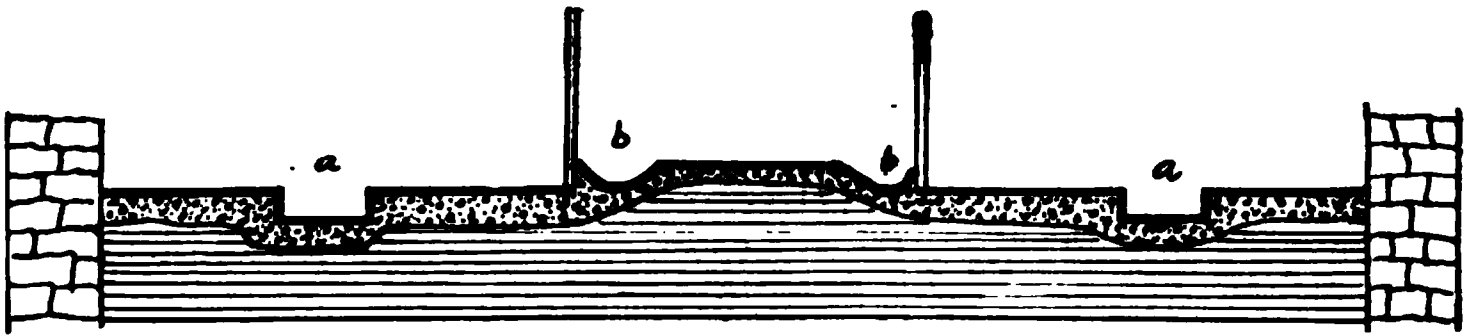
Shows cross-section of cement stable floor with mangers and gutters.
